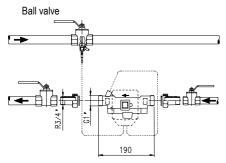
Example of integration with ball valve and meter with 190mm fitting
